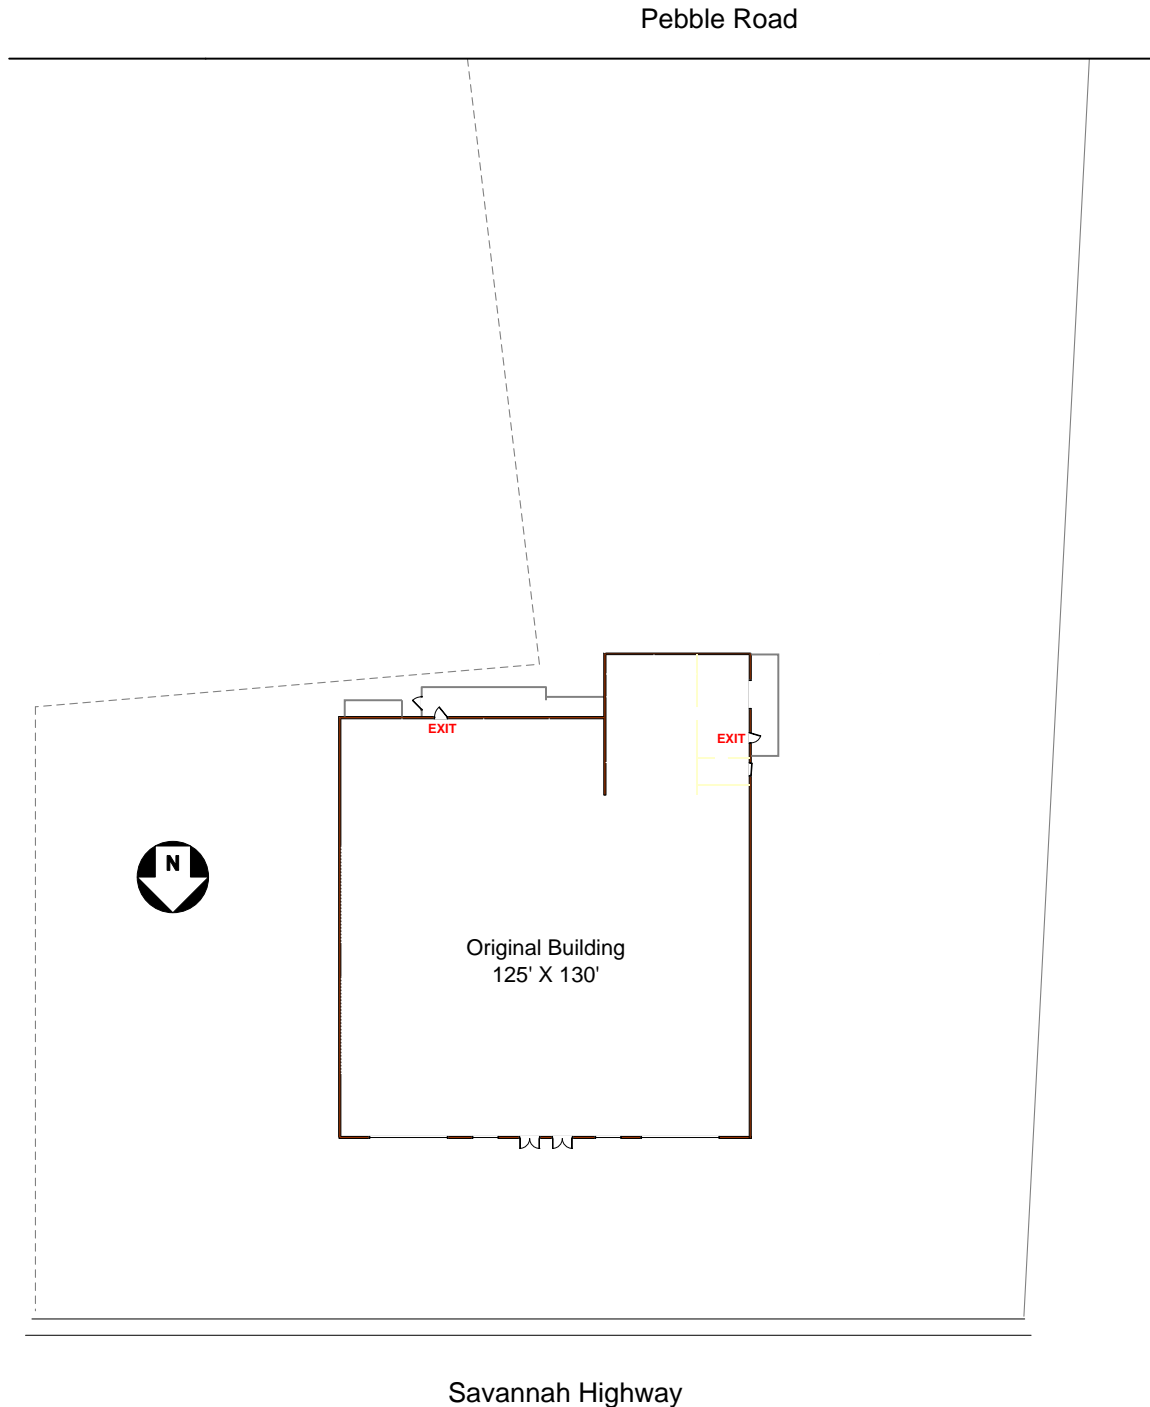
The original grocery store building was constructed in the 1950s or 1960s and annexed into the City of Charleston in 1990.
